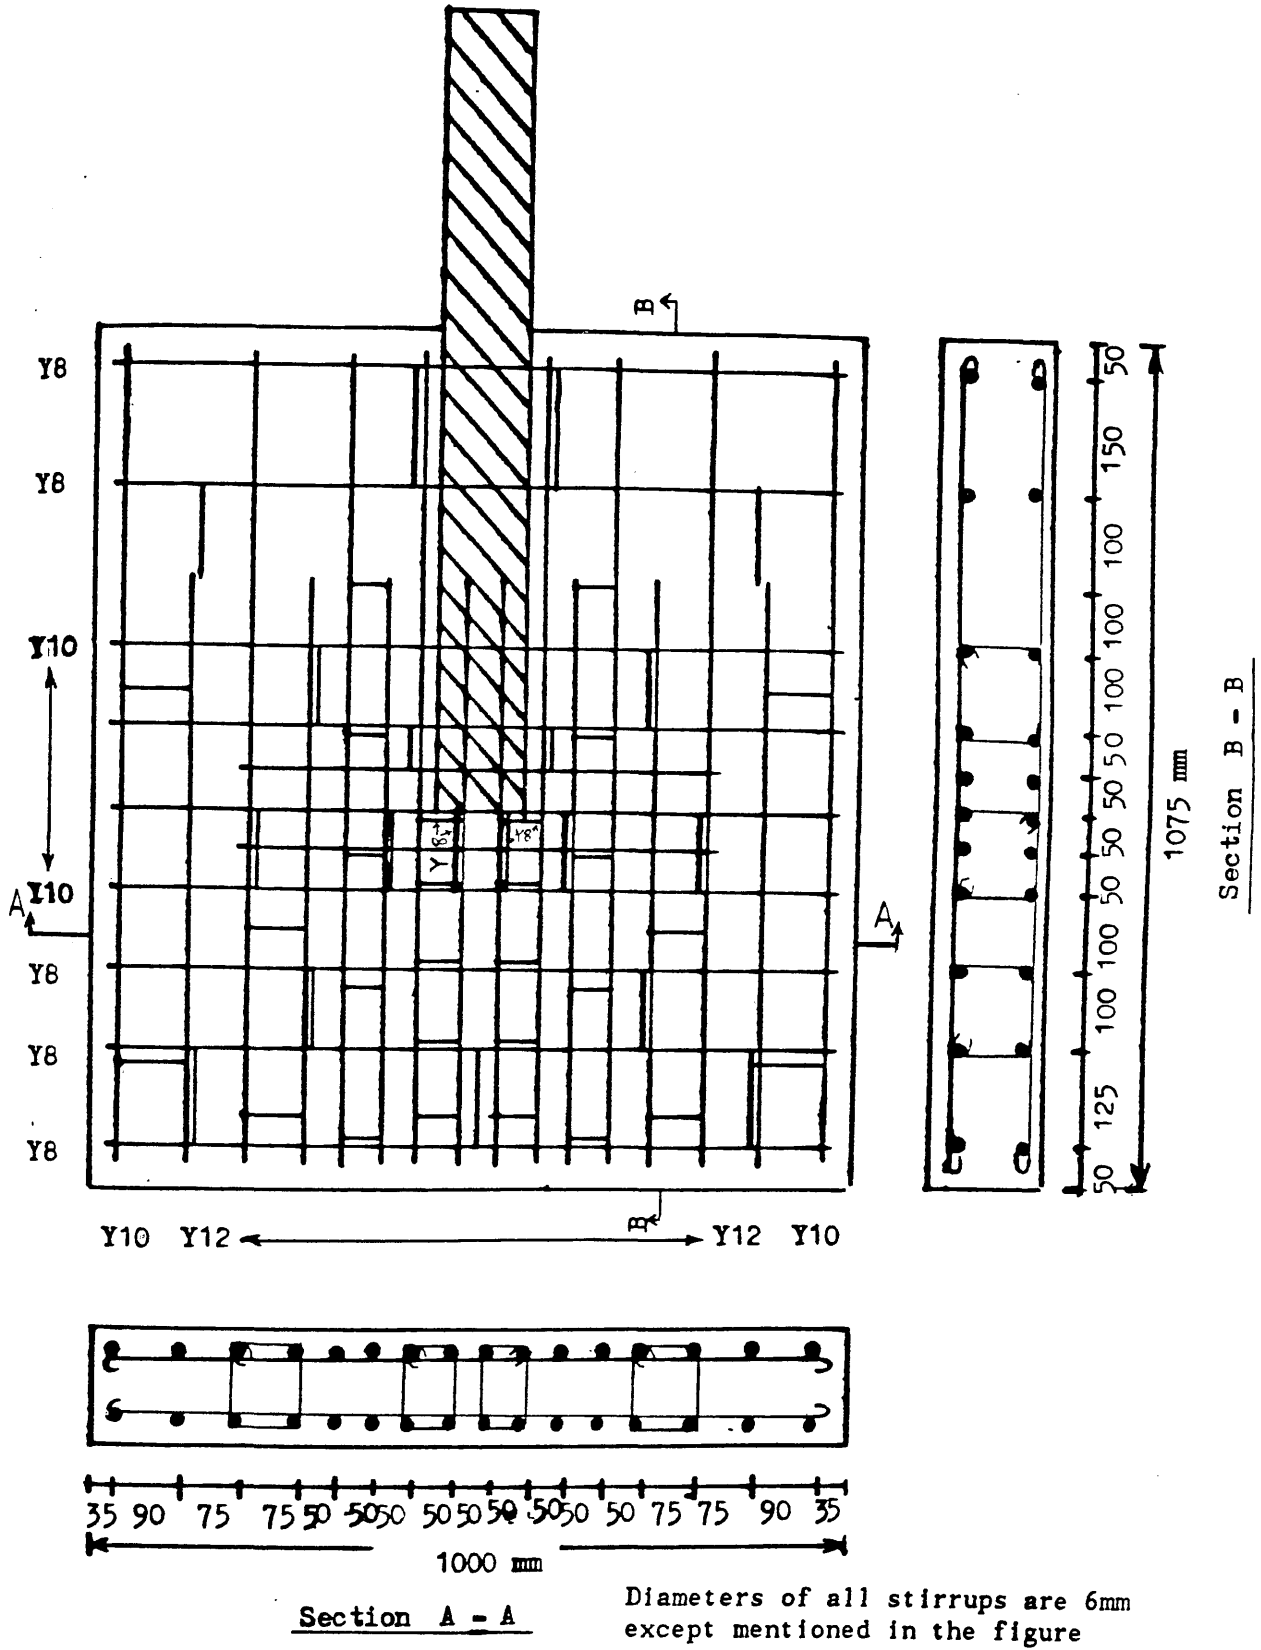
Arrangement of top and bottom reinforcing bars including closed vertical stirrup in the slab of model MRS14 (top and bottom steel bars are identical)
